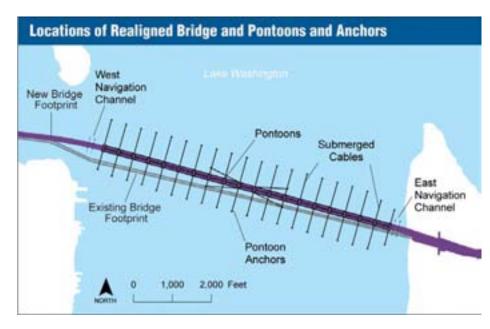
SR 520 Bridge Alignment and Anchors
